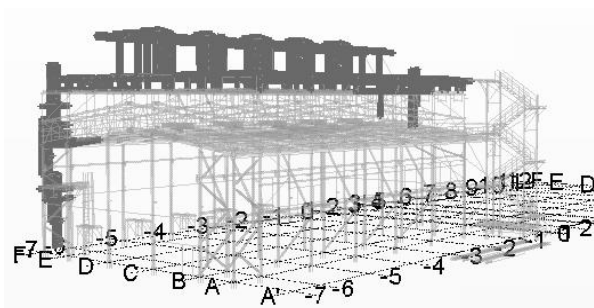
Installation sequence number 2: Bracings, lower support beams, crane beams, crane platforms, door second beams and door platforms.
